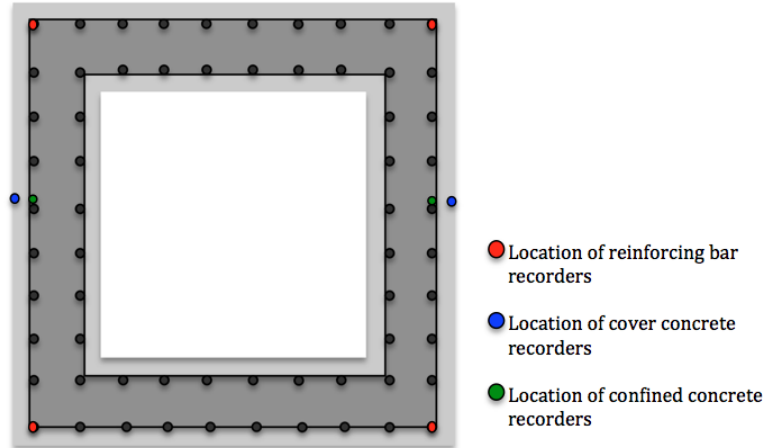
Location of Concrete and Reinforcing Steel Recorders
